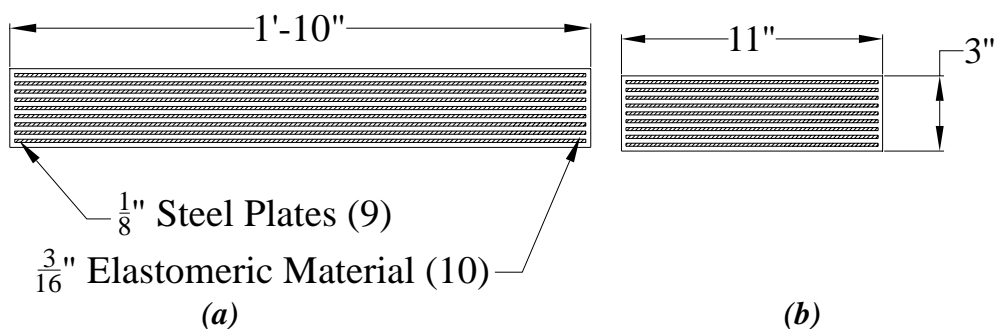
a) Bearing pad plate and elastomeric layer thickness b) side view of pad.
